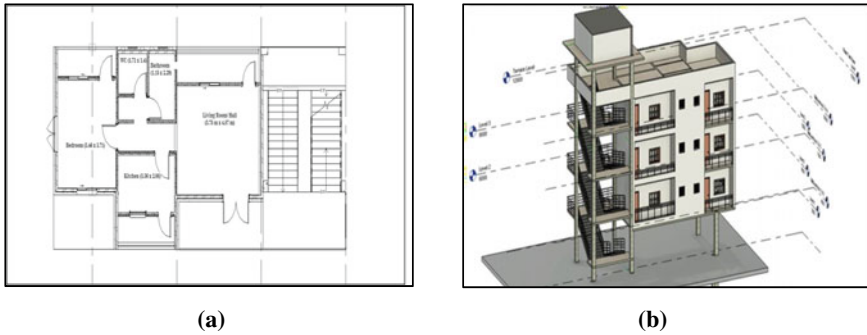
a, b Schematic Plan of 1 BHK Residential Flat and 3-D building model created for the case study
